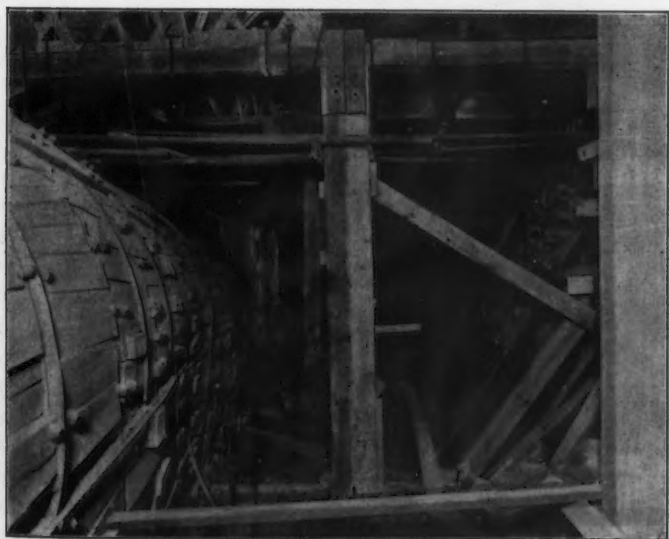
EXPRESS CUT. DRILLING FOR TRENCH TO RECEIVE LARGE GIRDERS.
